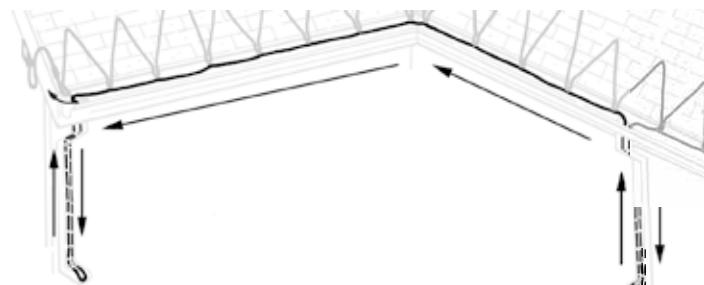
Cable routed back along the roofline in the gutter and downspouts
